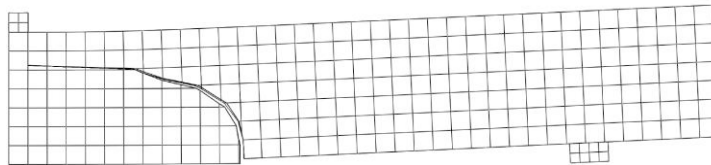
Shear crack of test beam 1L-2 just before failure load
